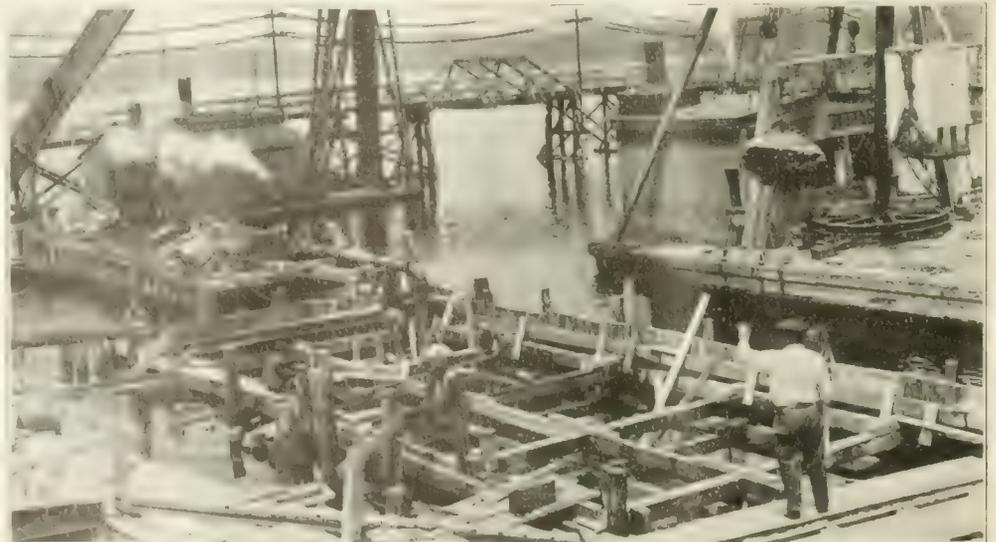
View of Cofferdam for Pier and Contractor's Equipment Used During Placing of Concrete—Larz Anderson Bridge.
